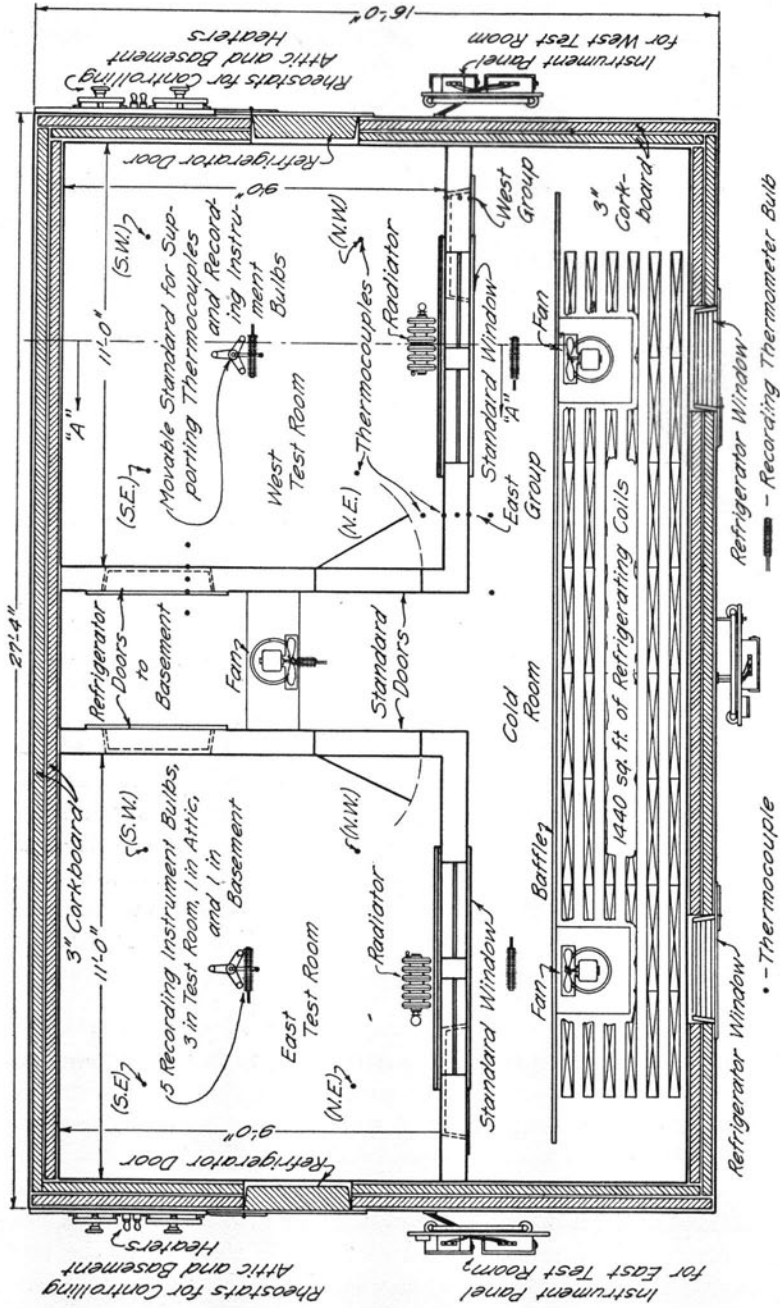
PLAN SECTION OF LOW TEMPERATURE TESTING PLANT
